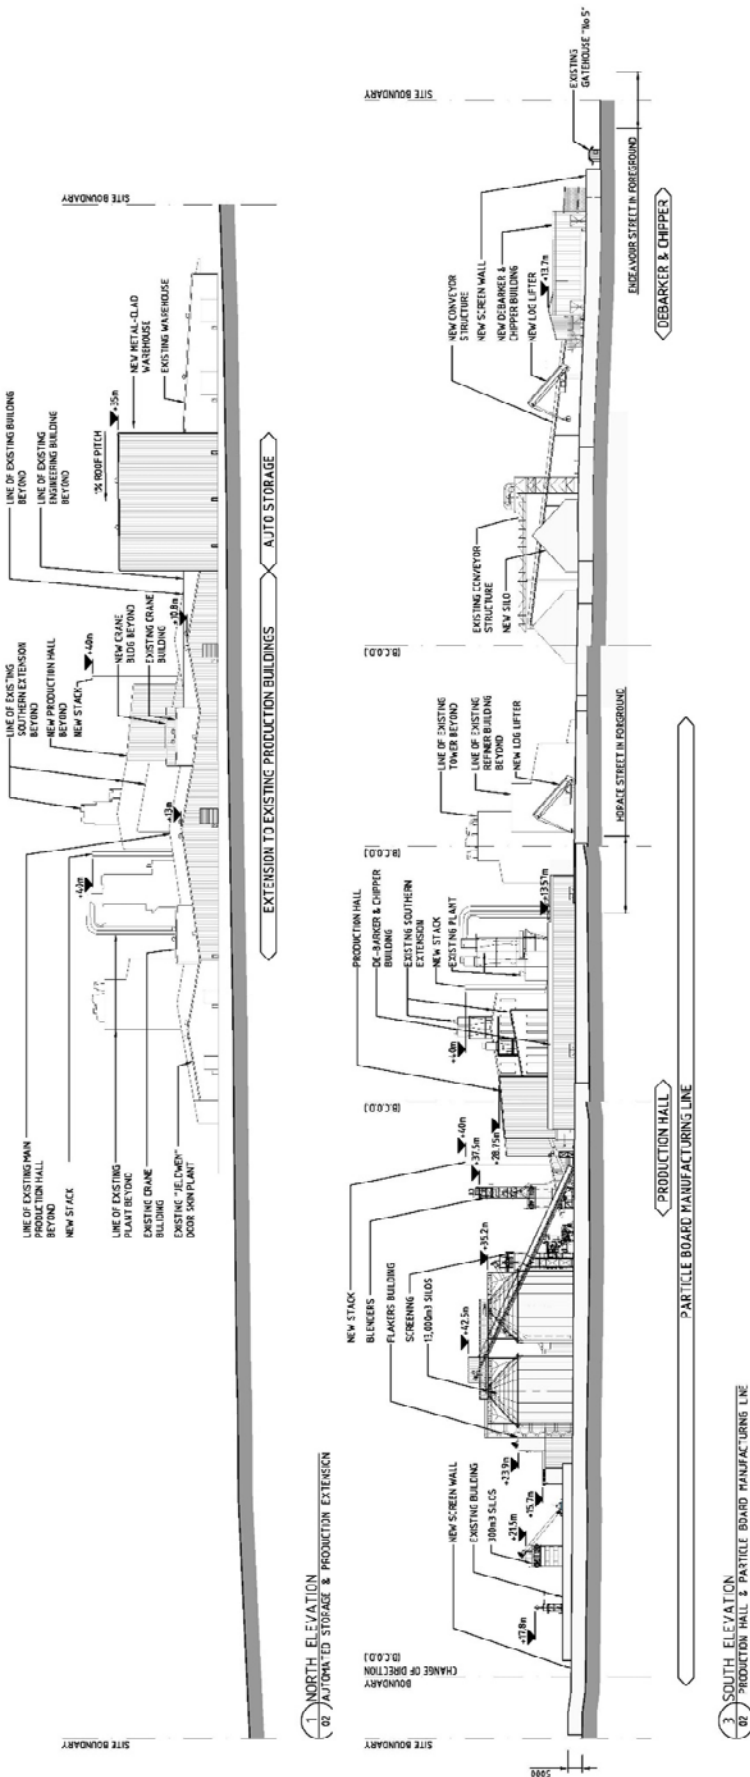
North and South Elevations of the Project (Source: Borg Panels)
